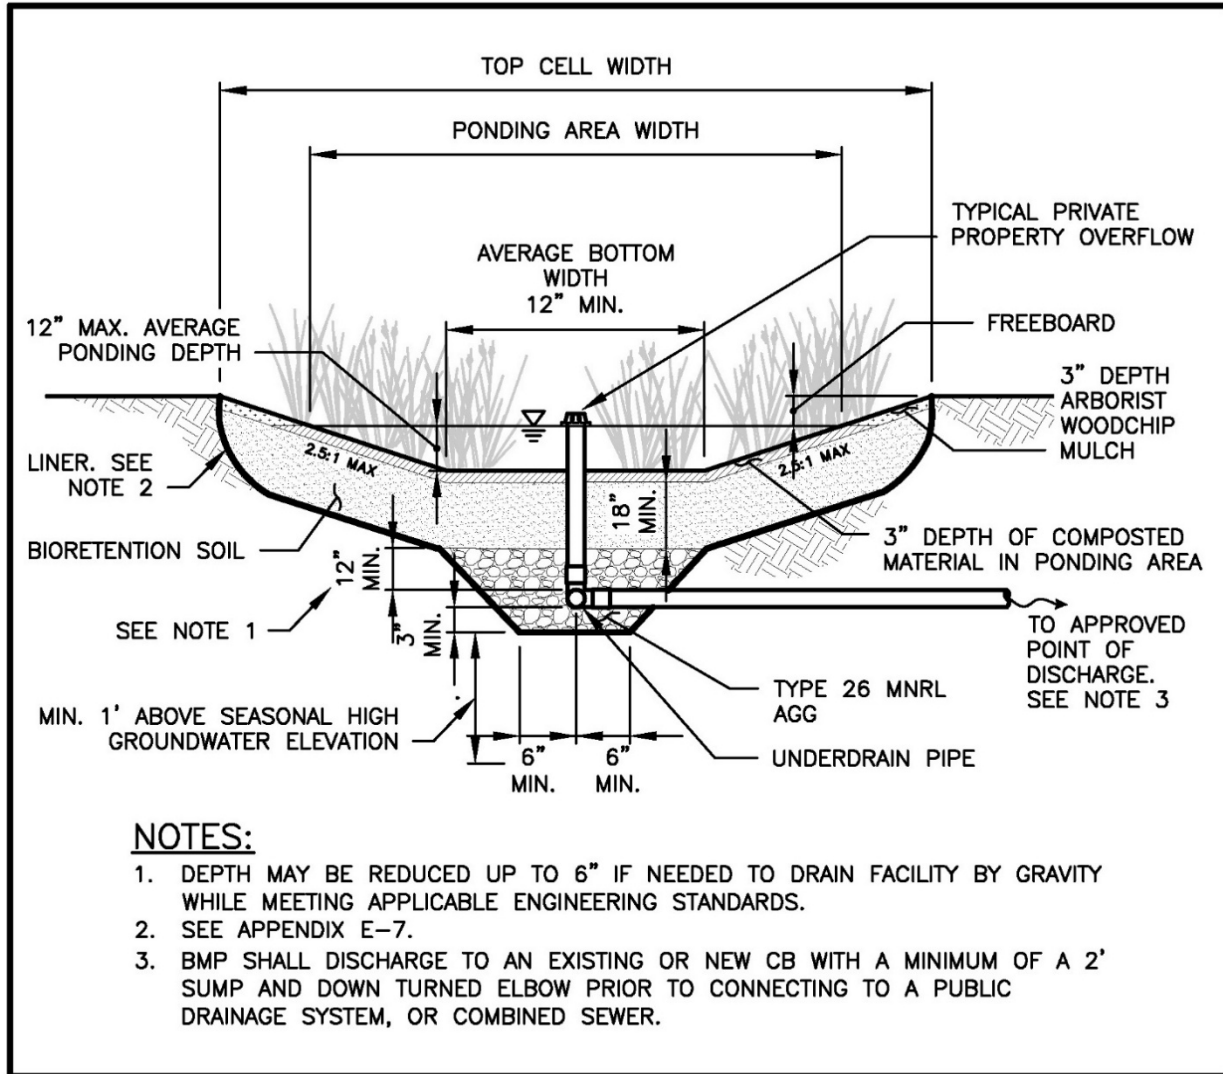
Non-infiltrating Bioretention Facility with Sloped Sides.
